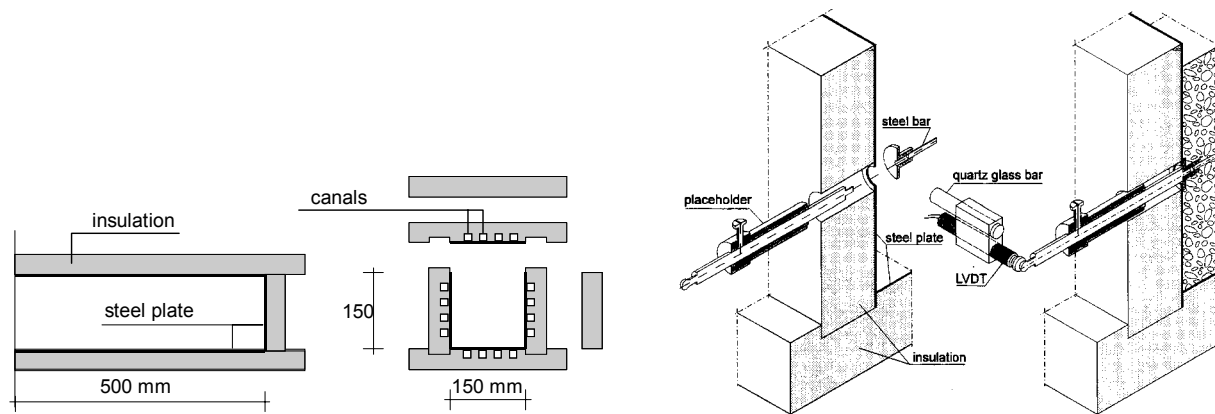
Mould (left) and details (right) of measurement device for determination of autogenous deformation of concrete.
